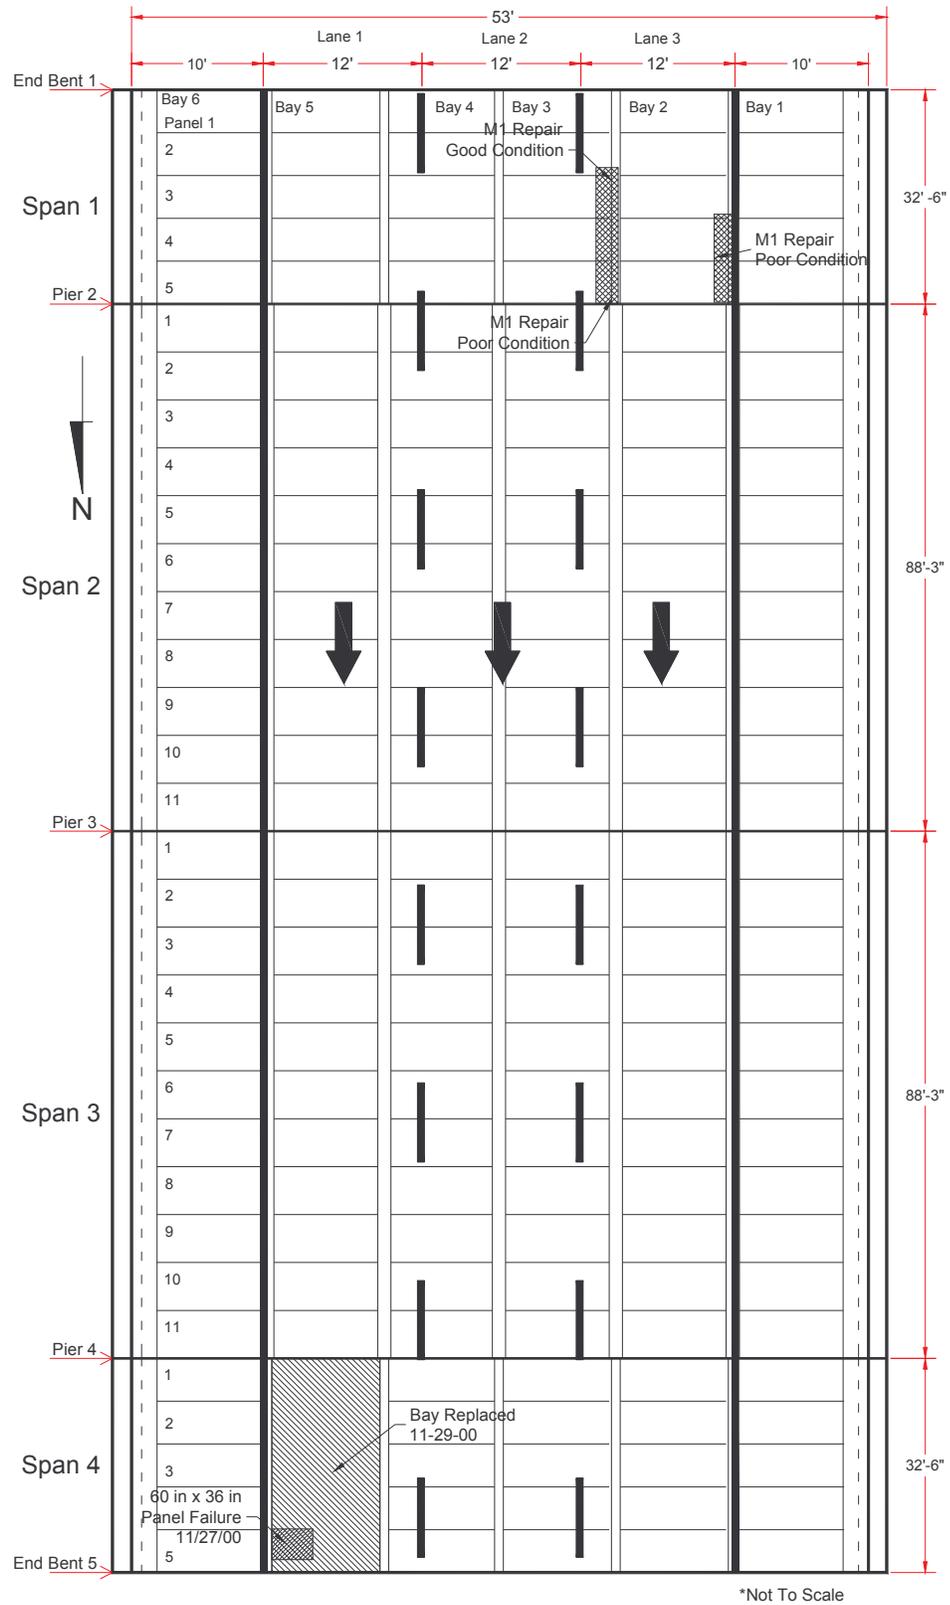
Location of Failed Panel, Bridge 170086 [3.4]
